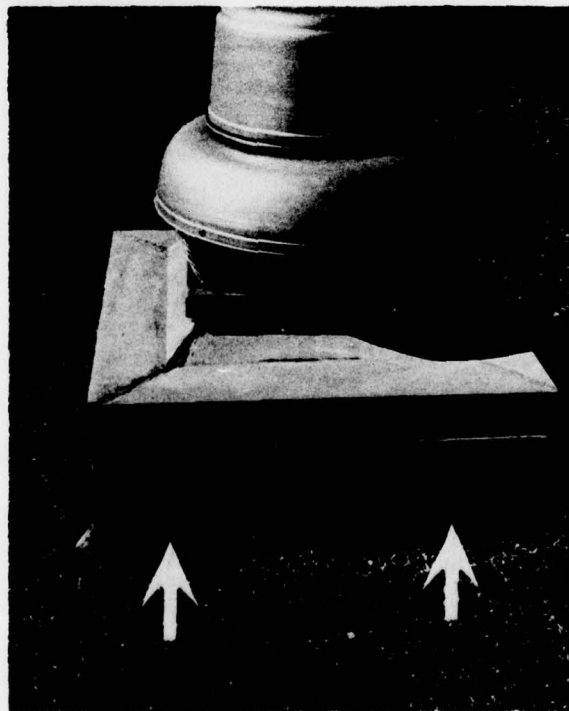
Arrows point to flaws in a vent flashing, Building 116.
